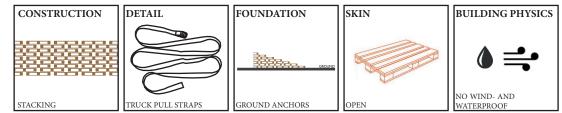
The pallet pavilion. Source: Fig 9. Connection, detail, foundation, skin and building physics method. (Own image) (Meinhold. B, 2014)
